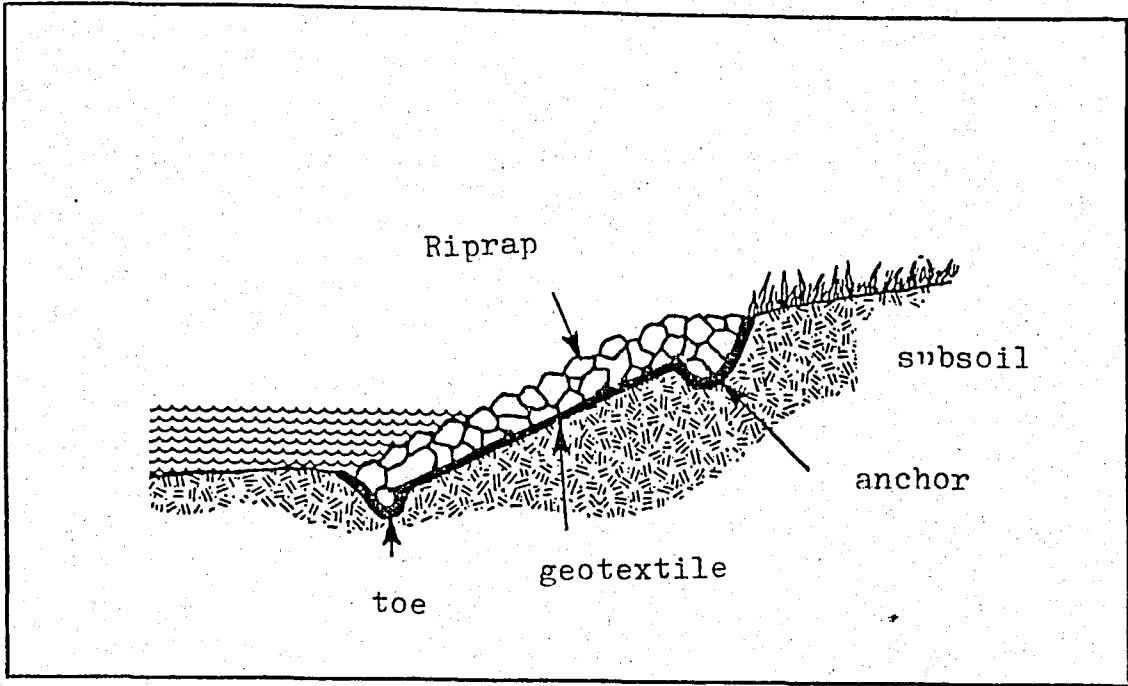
USE OF GEOTEXTILE IN STONE REVETMENT
